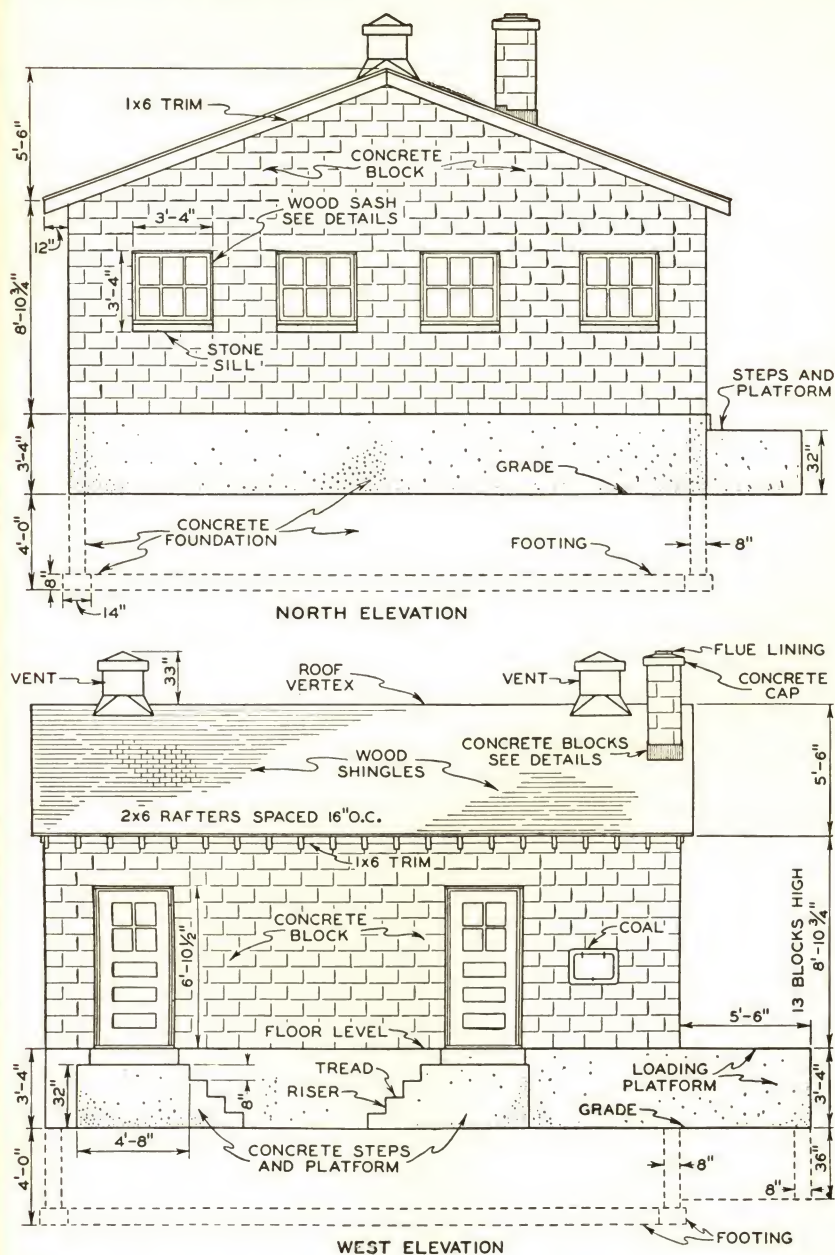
End and Front Elevation View Working Drawings for Milkhouse
